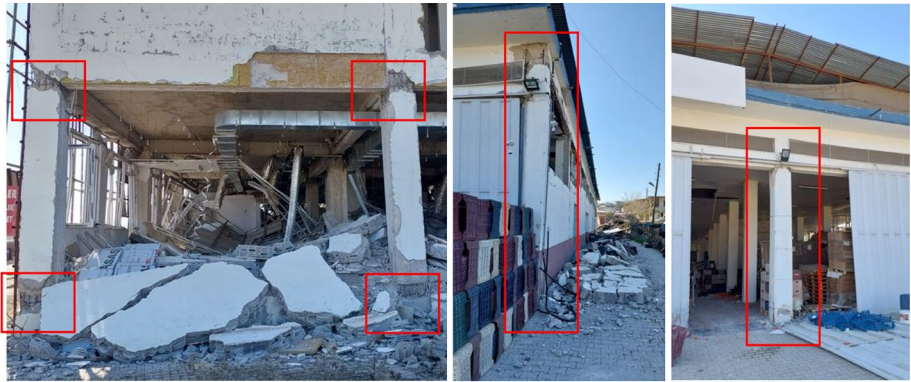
Severely damaged reinforced concrete facilities with significant lateral drifts and plastic hinges at column ends: in Turkoglu (left) and Antakya (middle and right)
